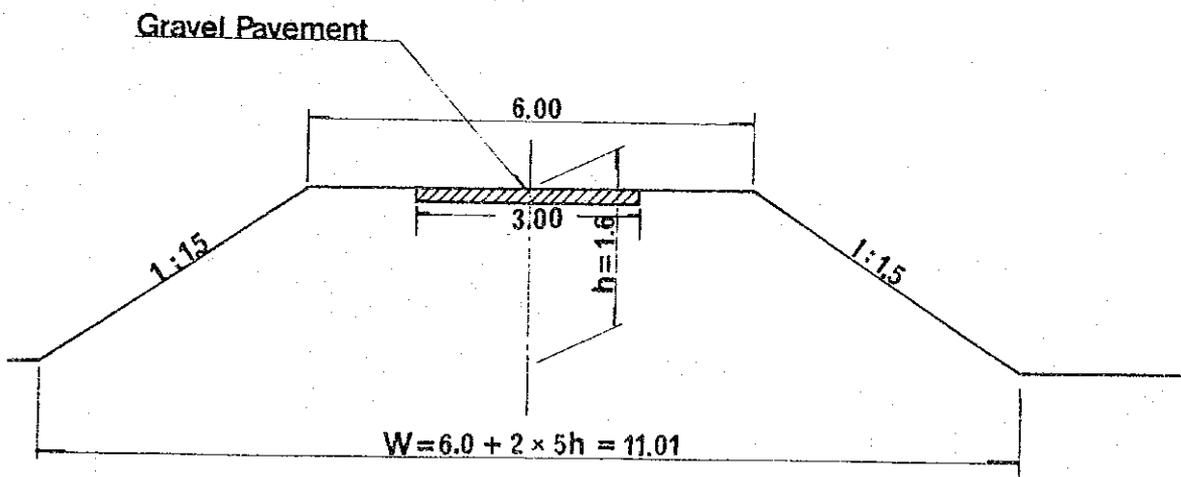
TRUNK ROAD STANDARD SECTION
